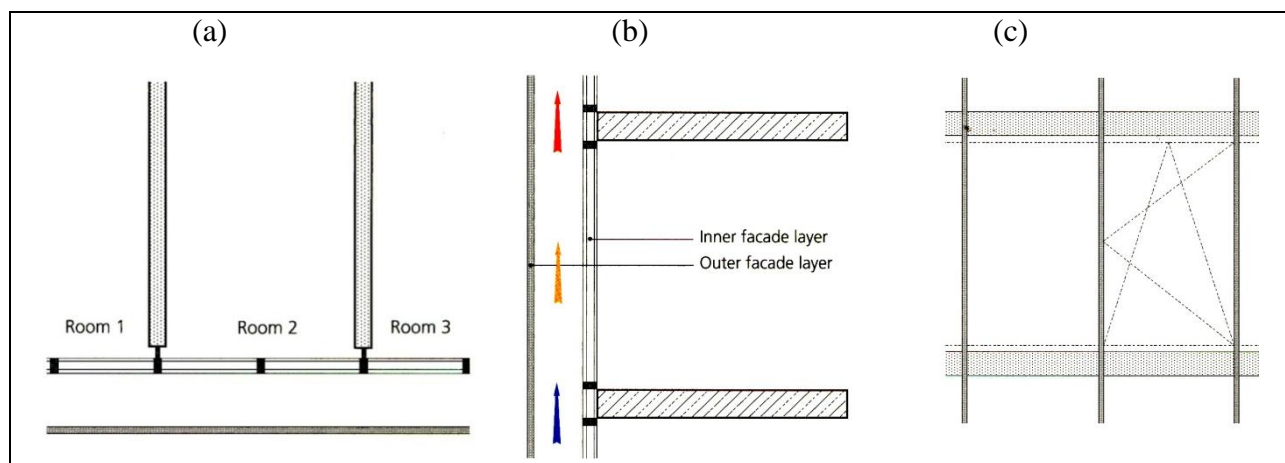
Multistory DSF: Plan (a); section (b) and elevation(c) (Osterle, 2001)
